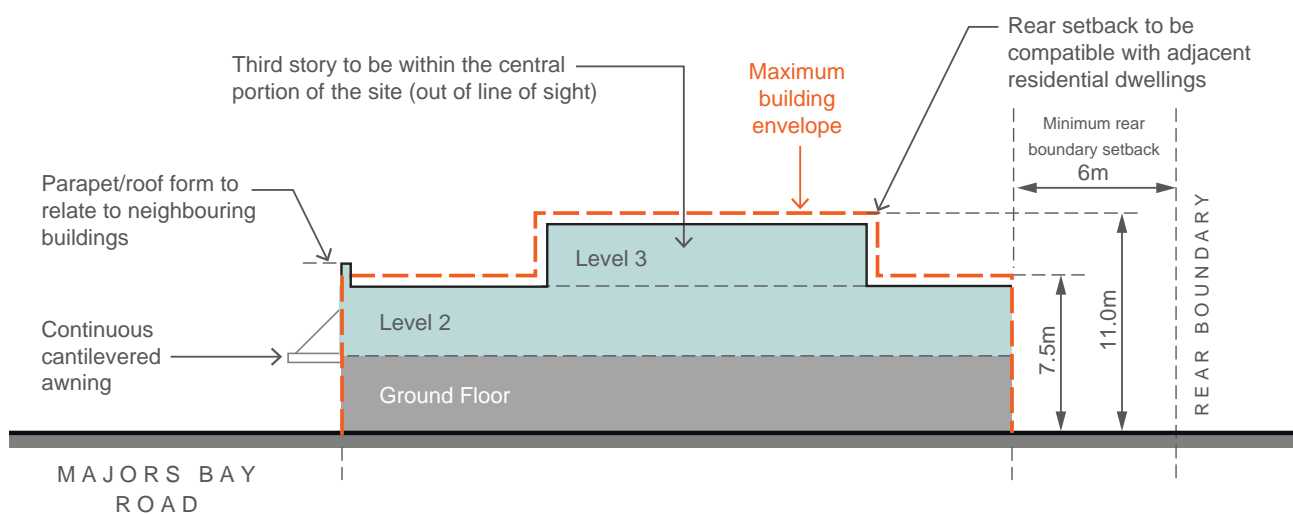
Majors Bay Shopping Centre - Maximum Building Envelope Section
